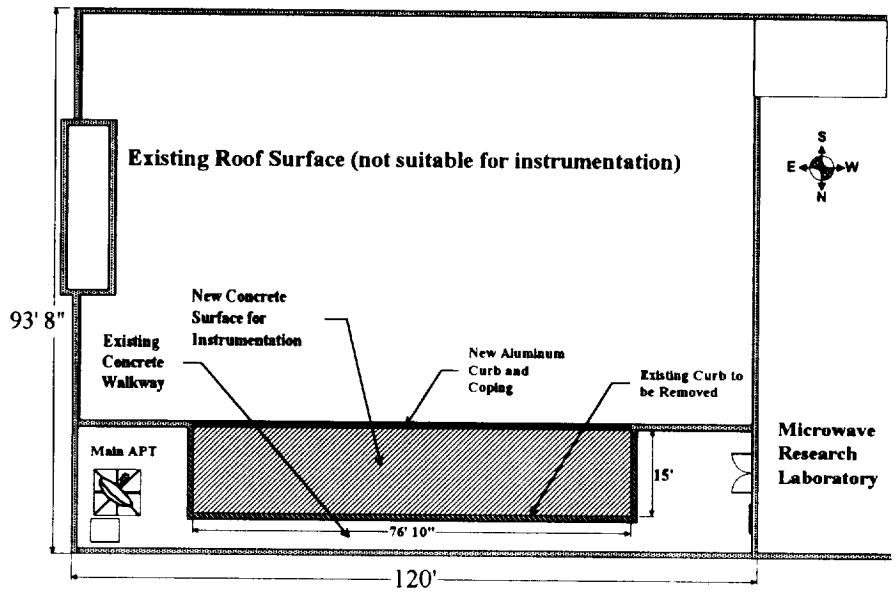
East Roof of USF's Electrical and CS&E Engineering Building
